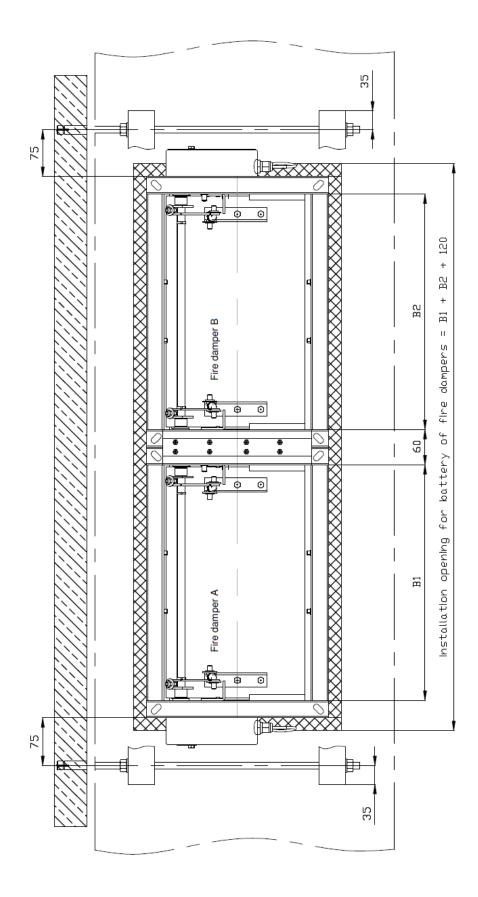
Installation of a battery consisting of two fire dampers KWP in horizontal arrangement in rigid compartment – front view.
